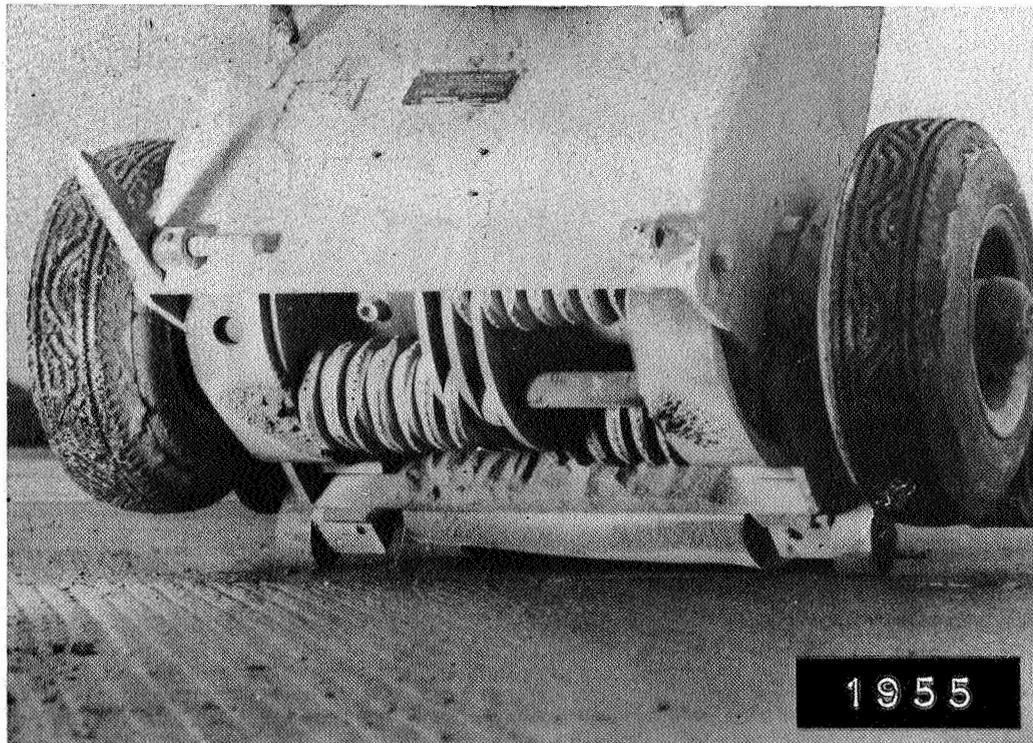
Disc fails to groove concrete or asphalt surfaces.
